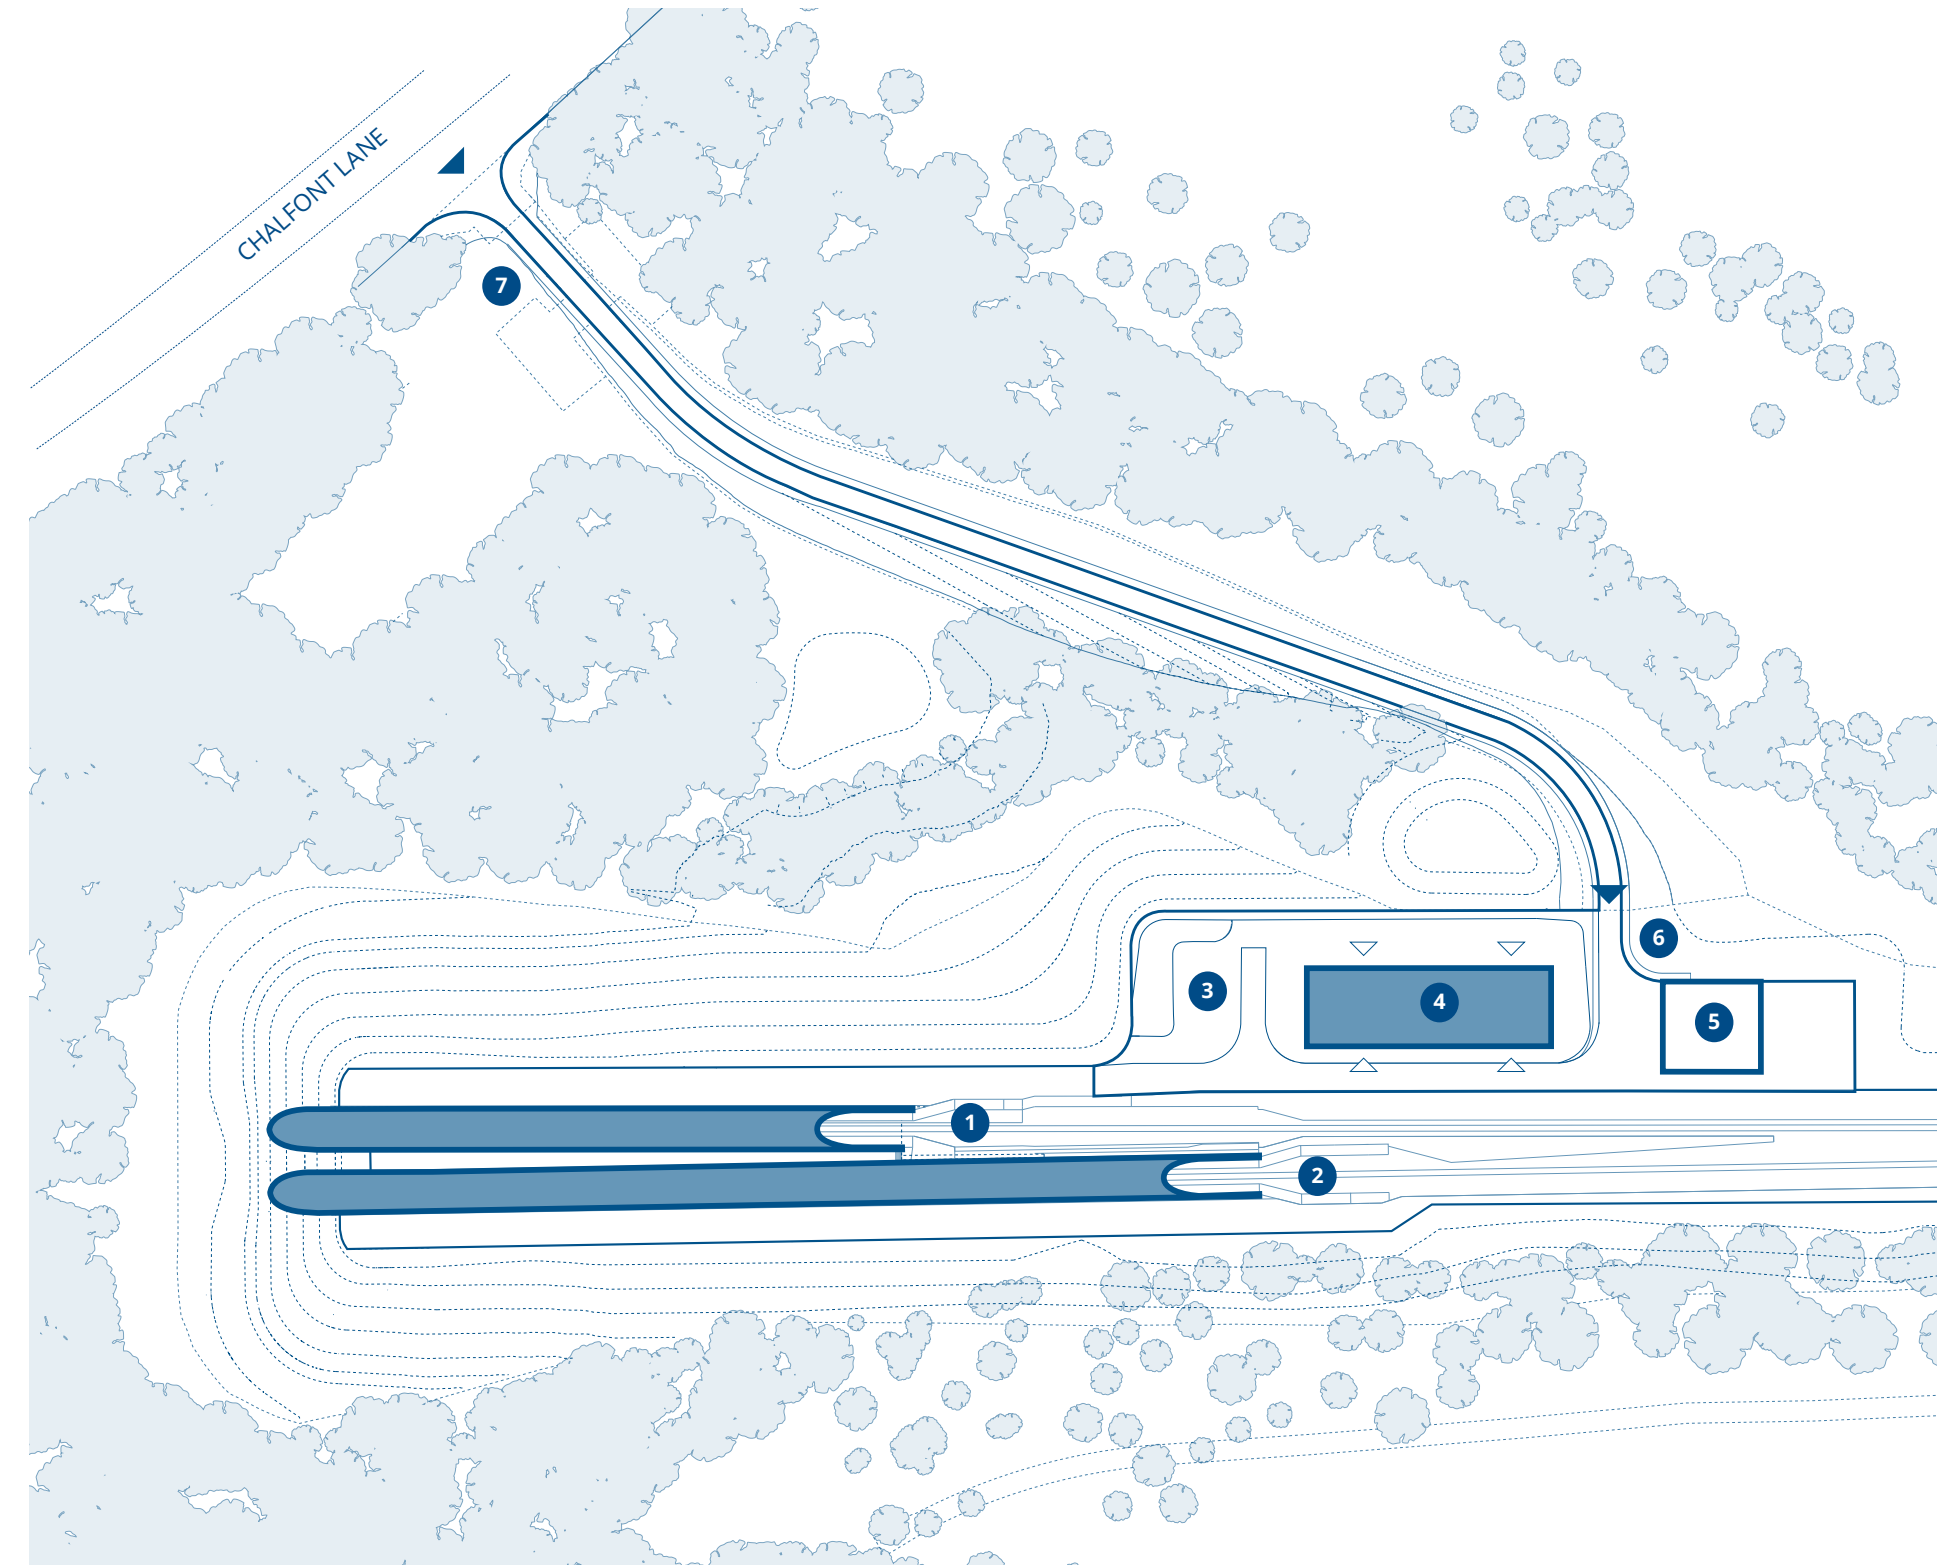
\_ Proposed site plan - Showing compound access road and tunnels
